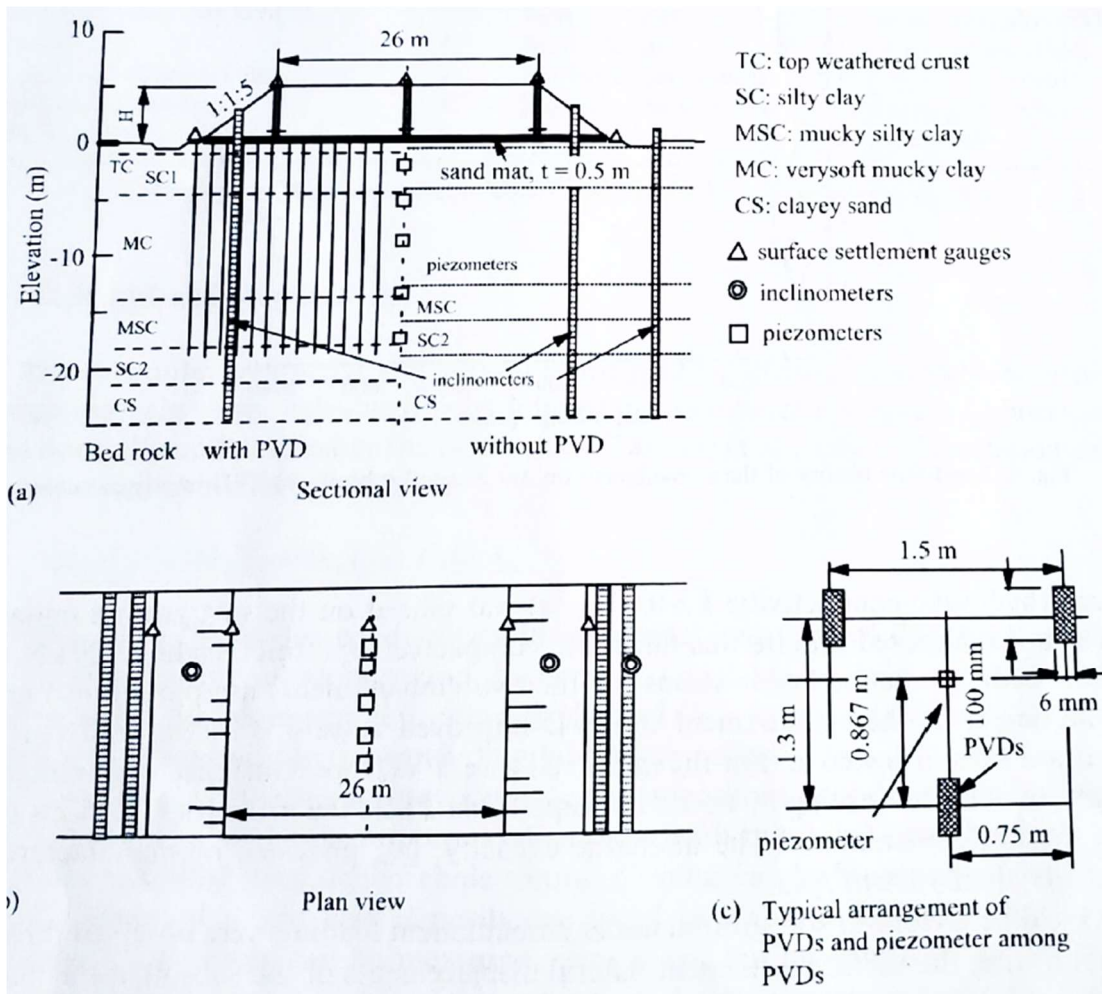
Shaoxing Test Embankment Plan and Elevation, from Shen et al. (2005)
